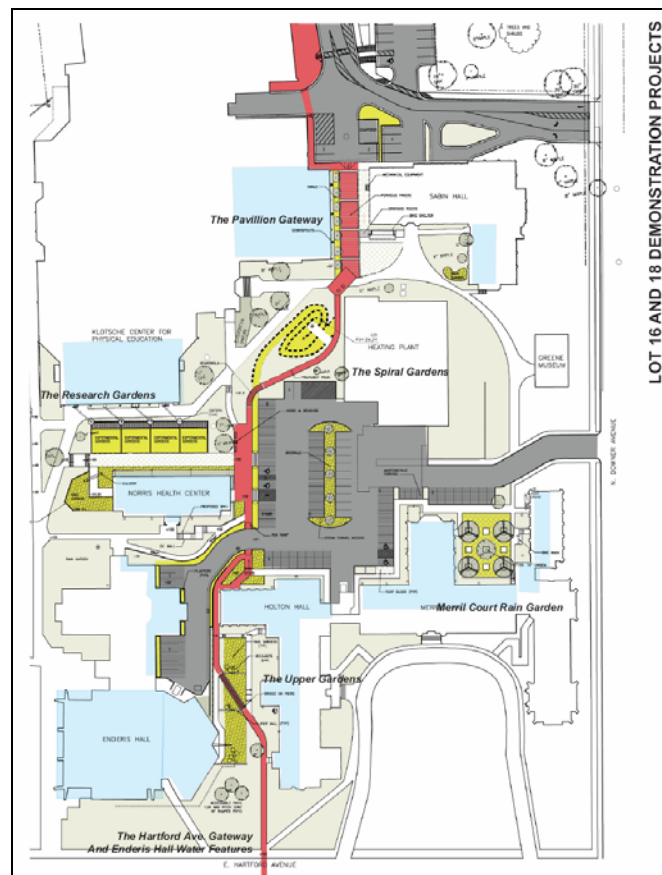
Design plan for parking lots 16 and 18 at UWM.
